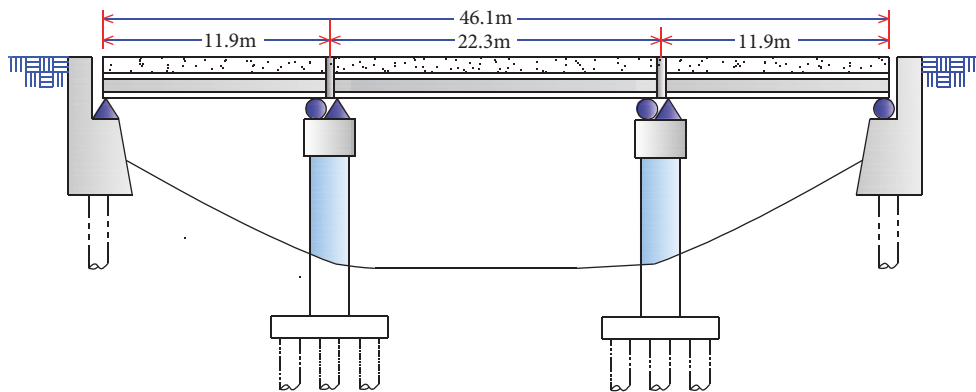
Configuration of the example MSC concrete girder bridge.
